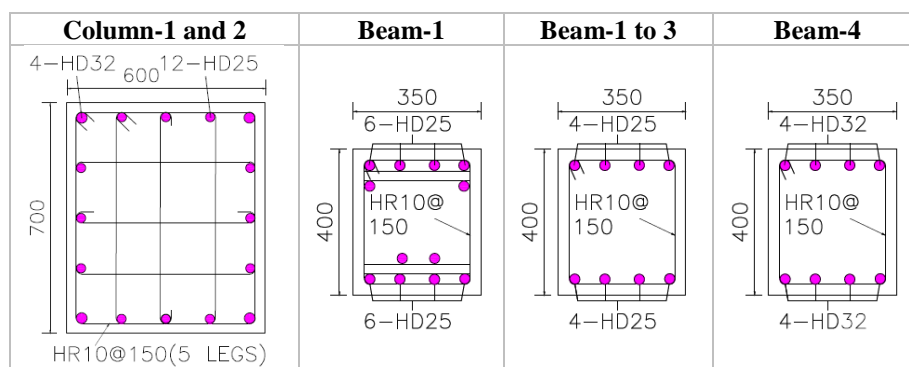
Cross sections of the tested precast concrete specimens (all dimensions are in mm)
